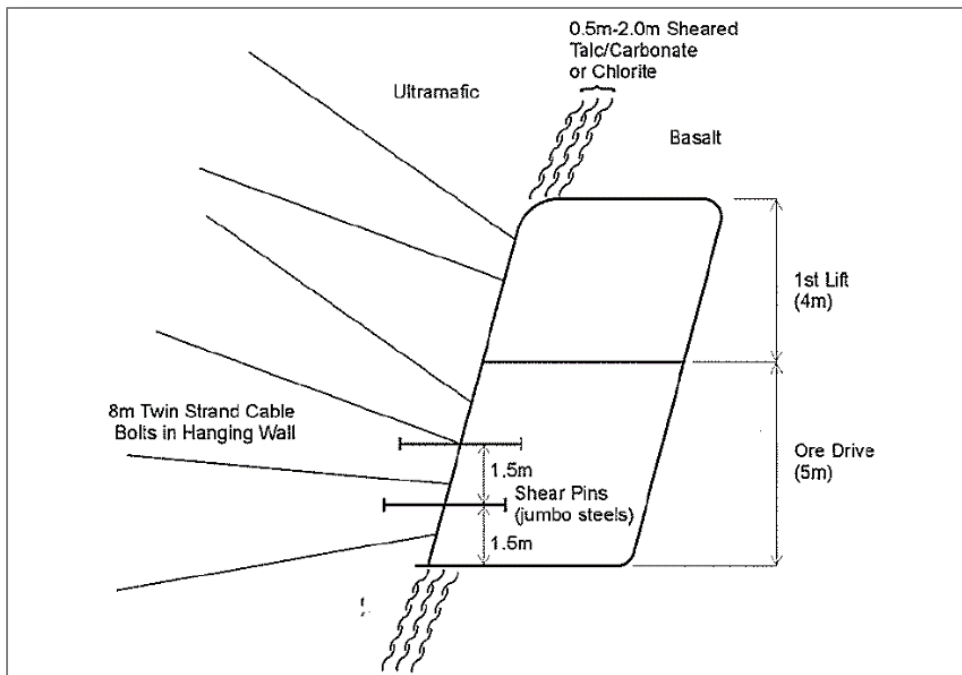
| DRIVE CONSTRUCTION FOR SILL PILLAR PLACEMENT (FINN & DORRICOFF, 2002)
